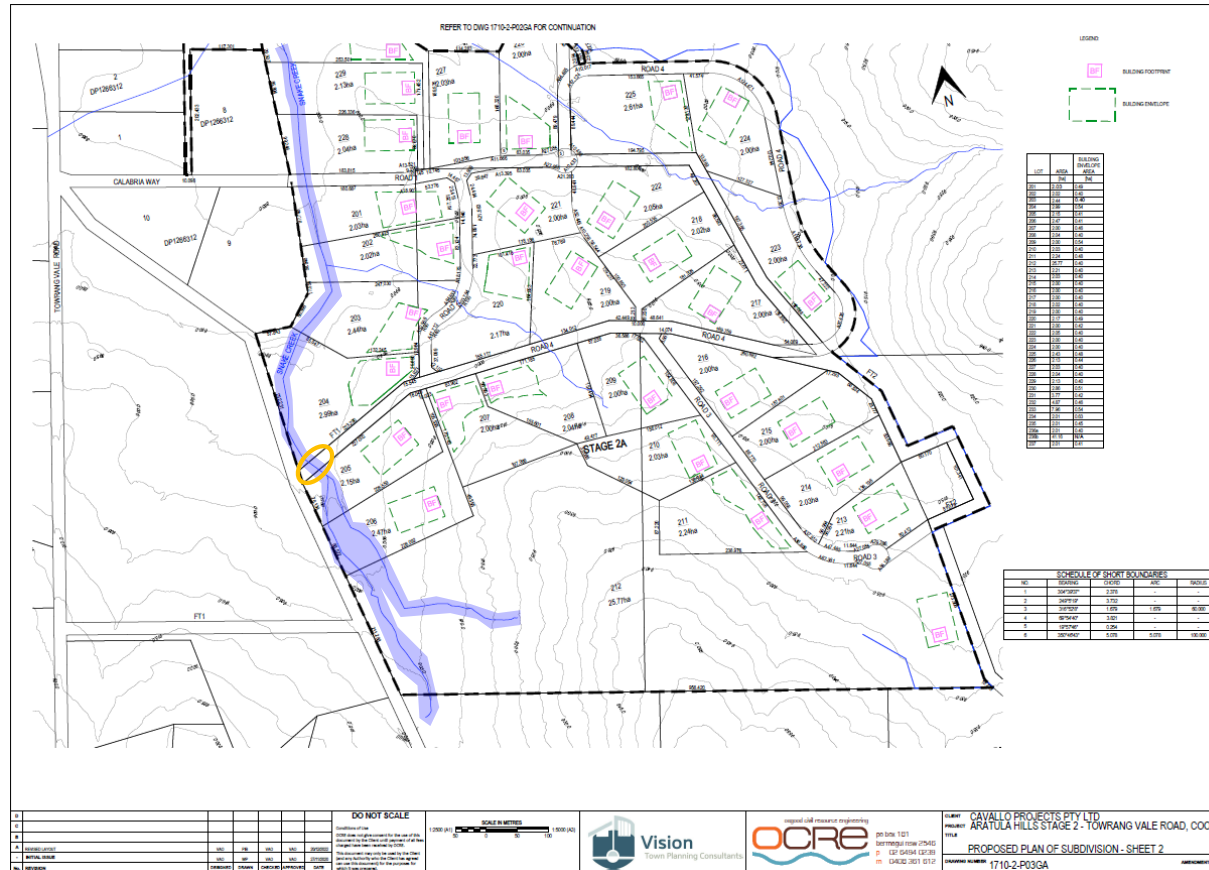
Building footprint (BF) and building envelopes (outlined in green) within each proposed lot. Snake Creek Conservation Area shaded blue.
